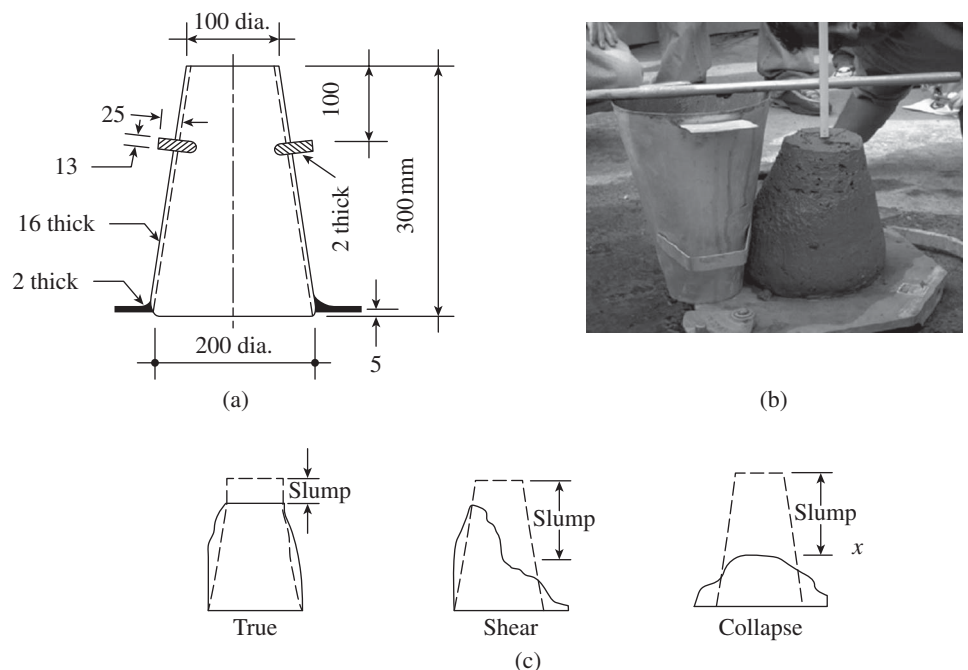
Slump testing (a) Typical mould for slump test (b) Measuring slump (c) Types of slump
